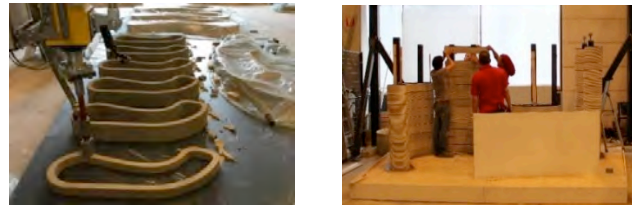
(a,b). (a) Printing of elements flat in parts, (b) Assembly of the printed elements
